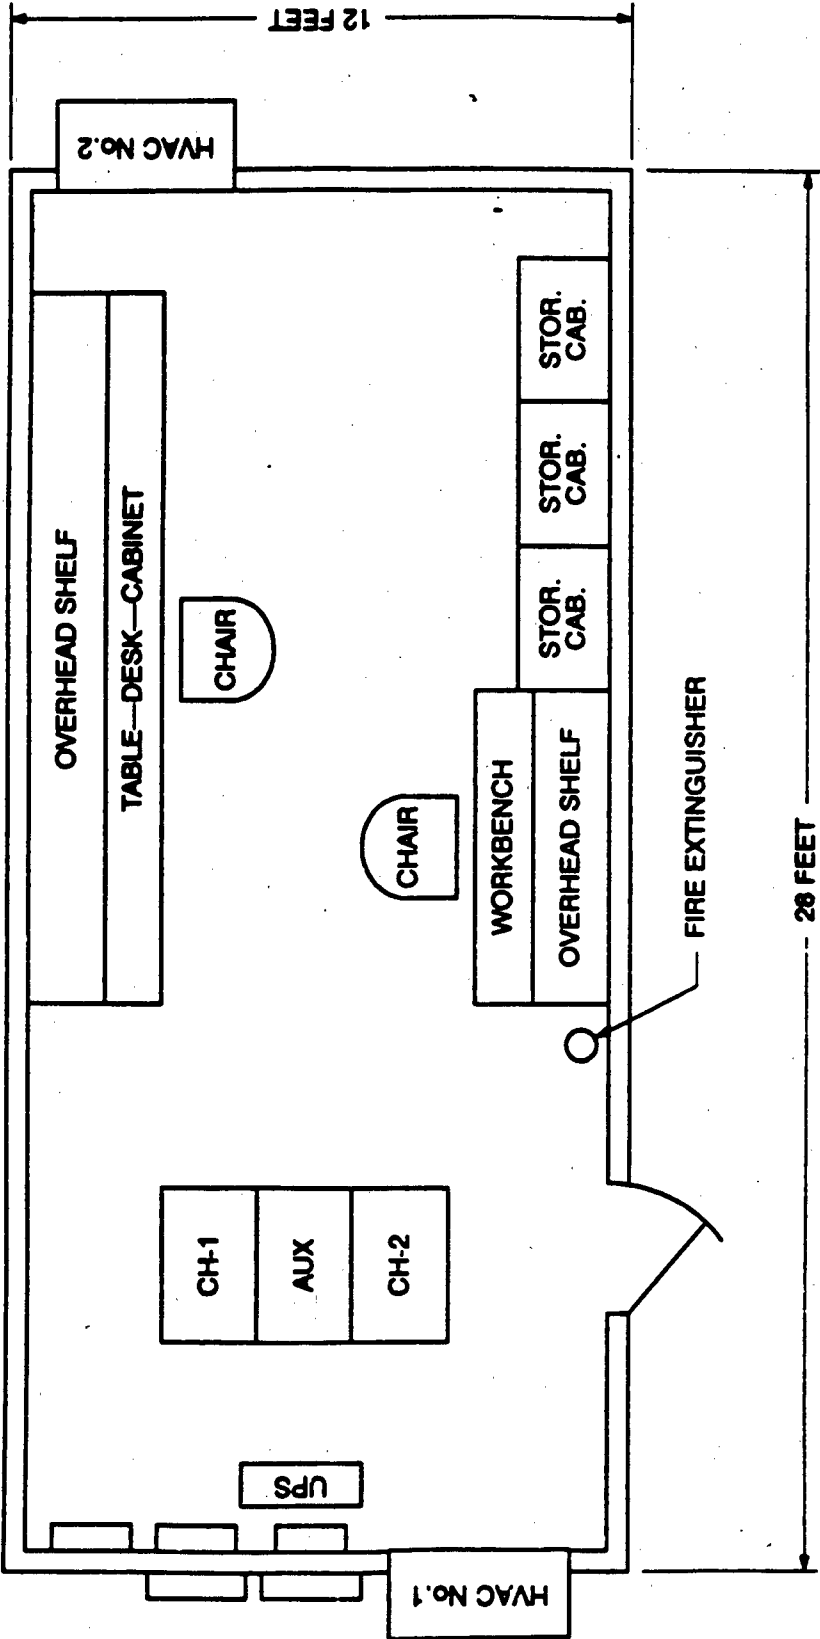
PRM OPS SITE EQUIPMENT LAYOUT
